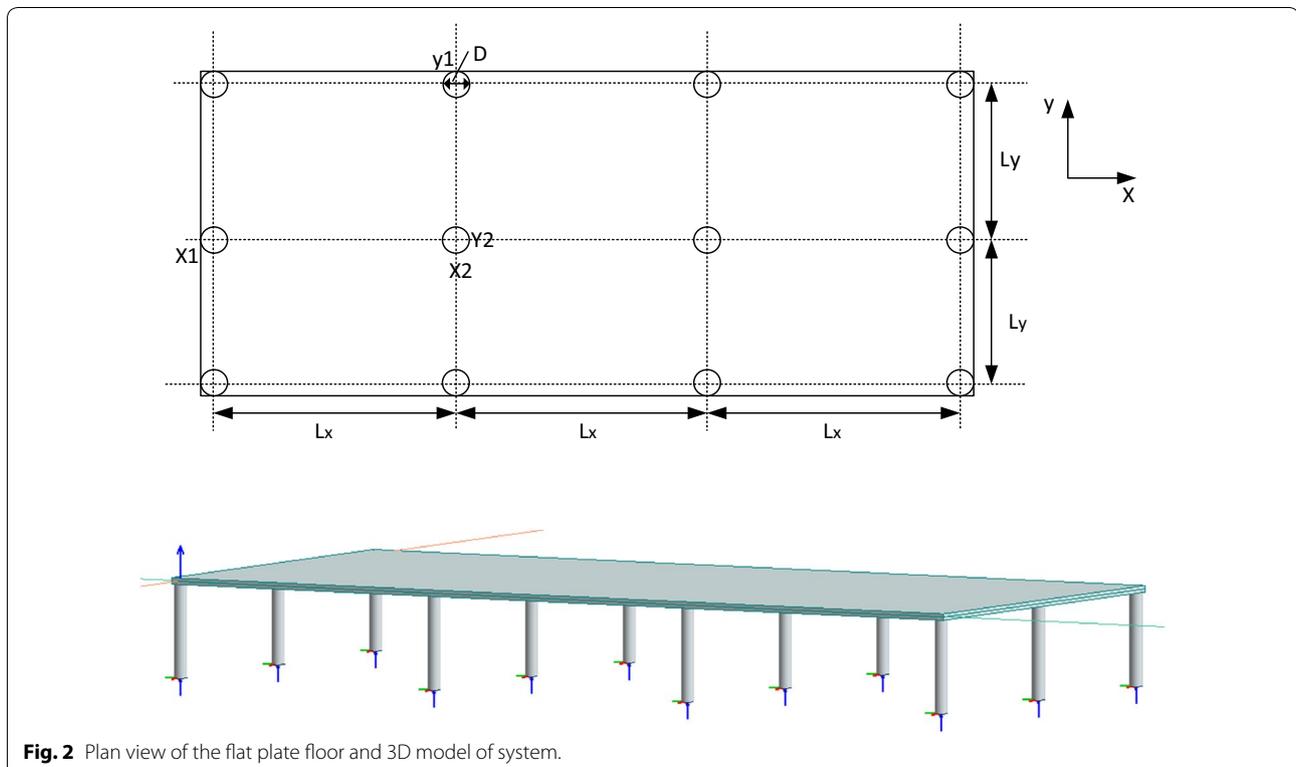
Plan view of the flat plate floor and 3D model of system.
